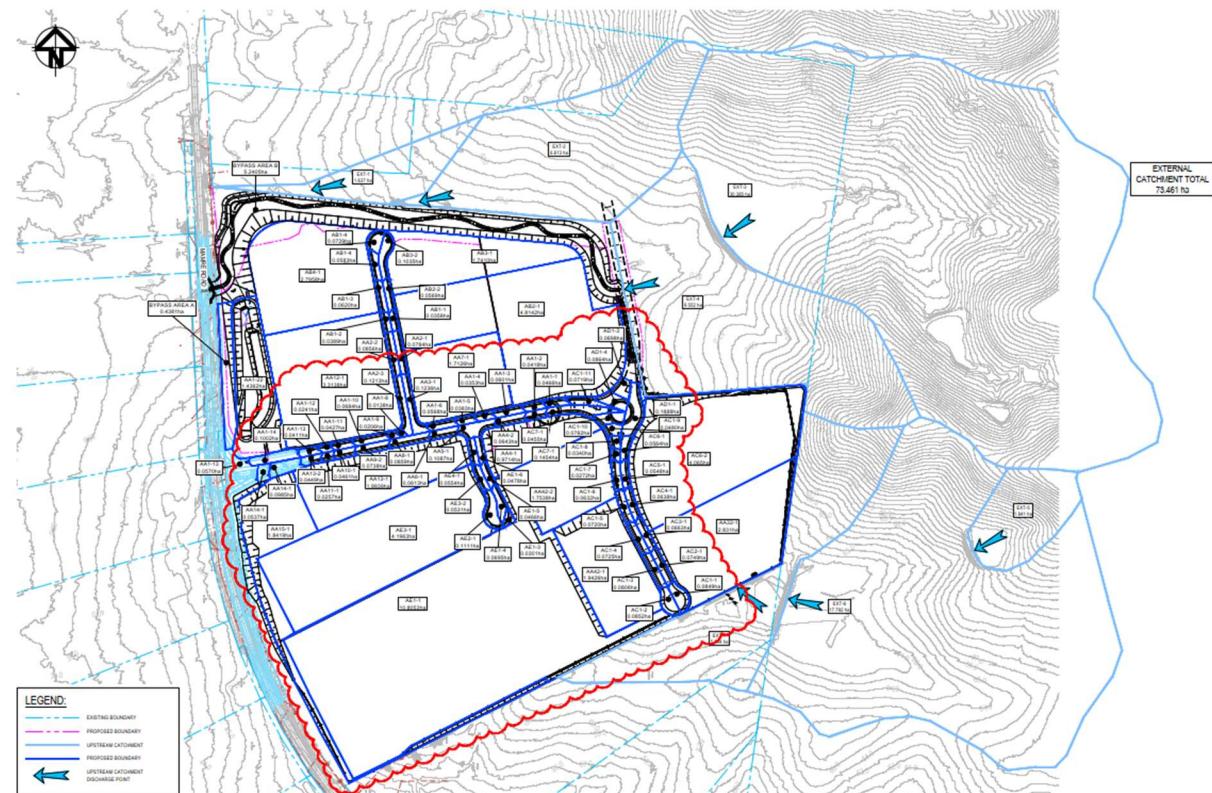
Mamre Road Precinct Stormwater Scheme Plan (Sydney Water, December 2022)
